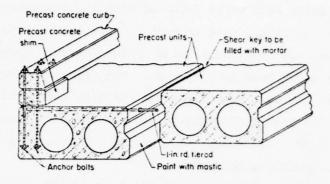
Precast concrete slab bridge developed by the South Carolina Highway Department (courtesy of Portland Cement Association⁷)
